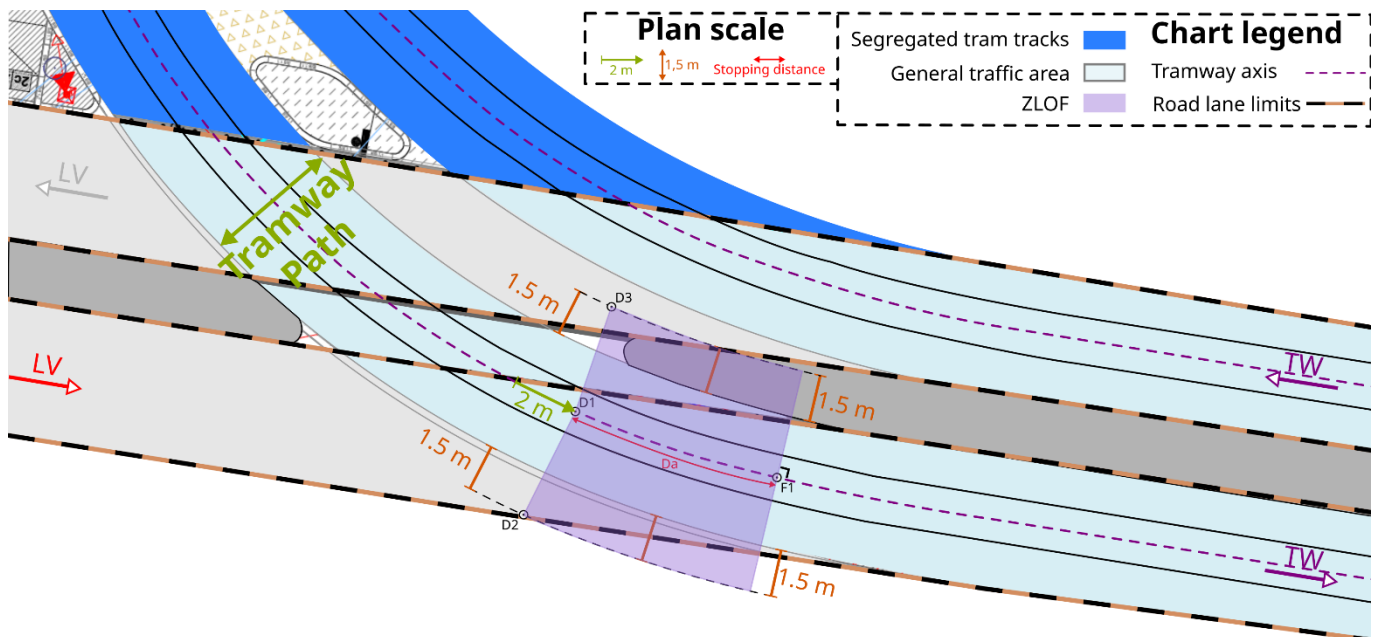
Example of a ZLOF layout at a general traffic area entry with the tramway platform in straight alignment
